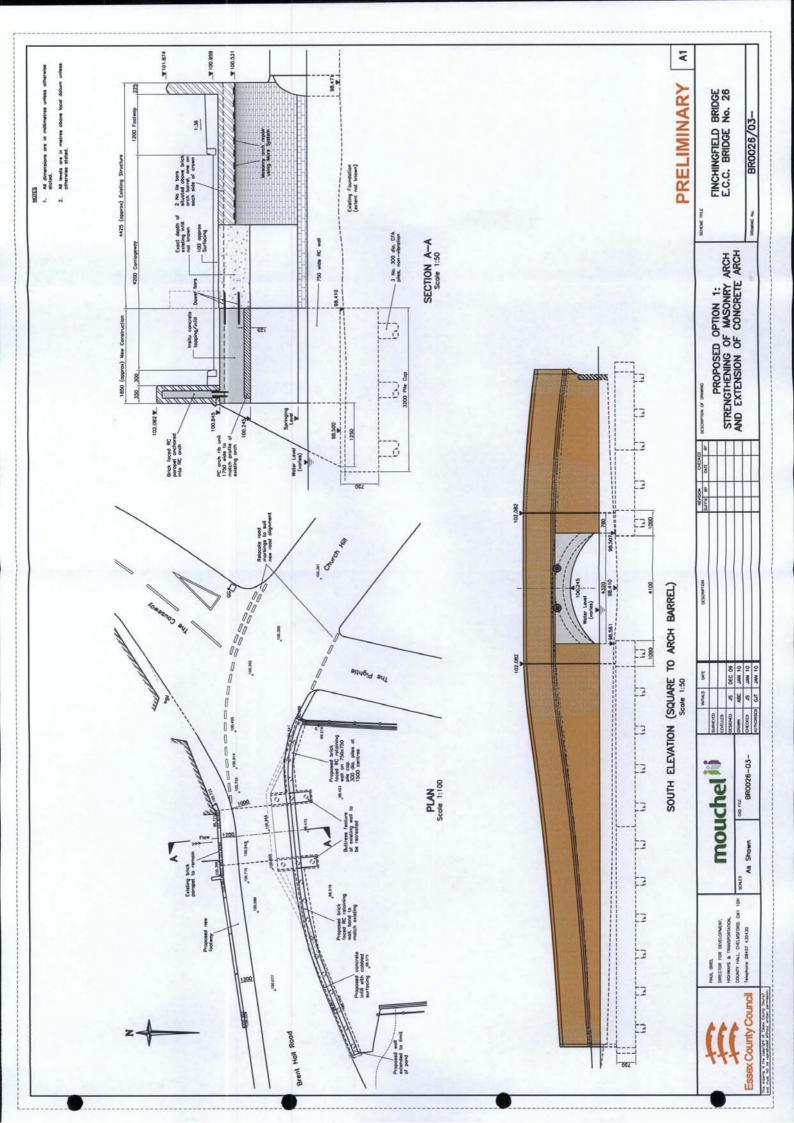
/03– Reconstruction Option 1 Masonry Arch Strengthening and Extension of Mass Concrete Arch
